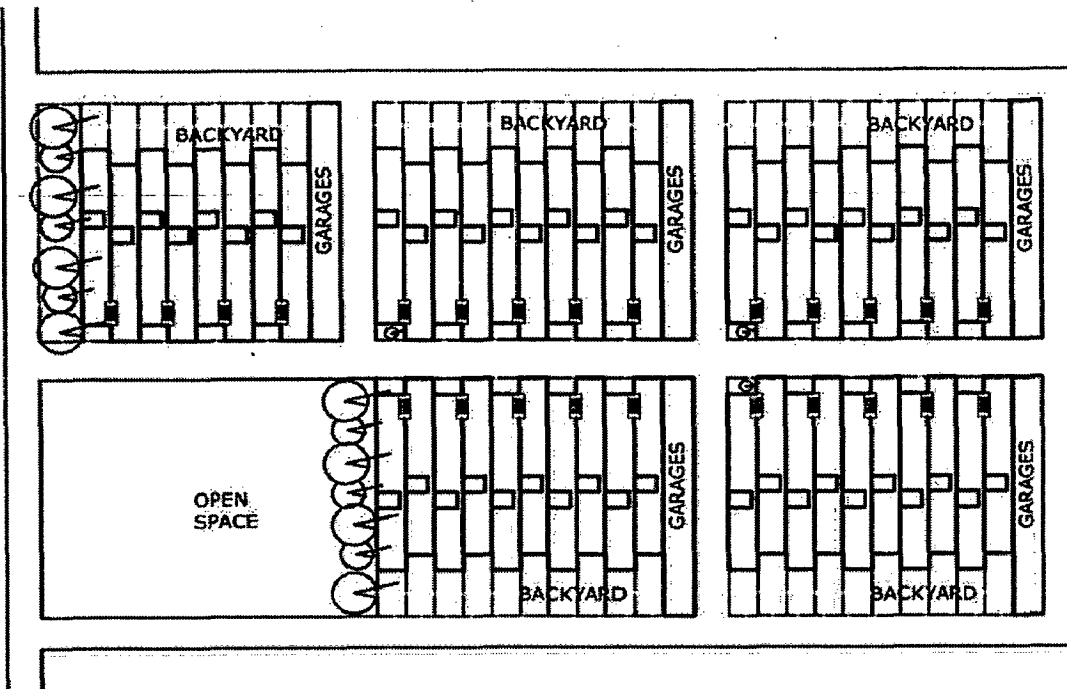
Site plan option-2 and view in rectangular site of Option-2
